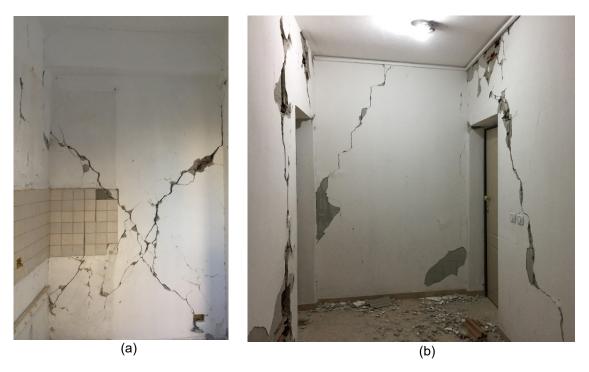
Diagonal cracks in masonry infills (photos: SUZI-SAEE).
